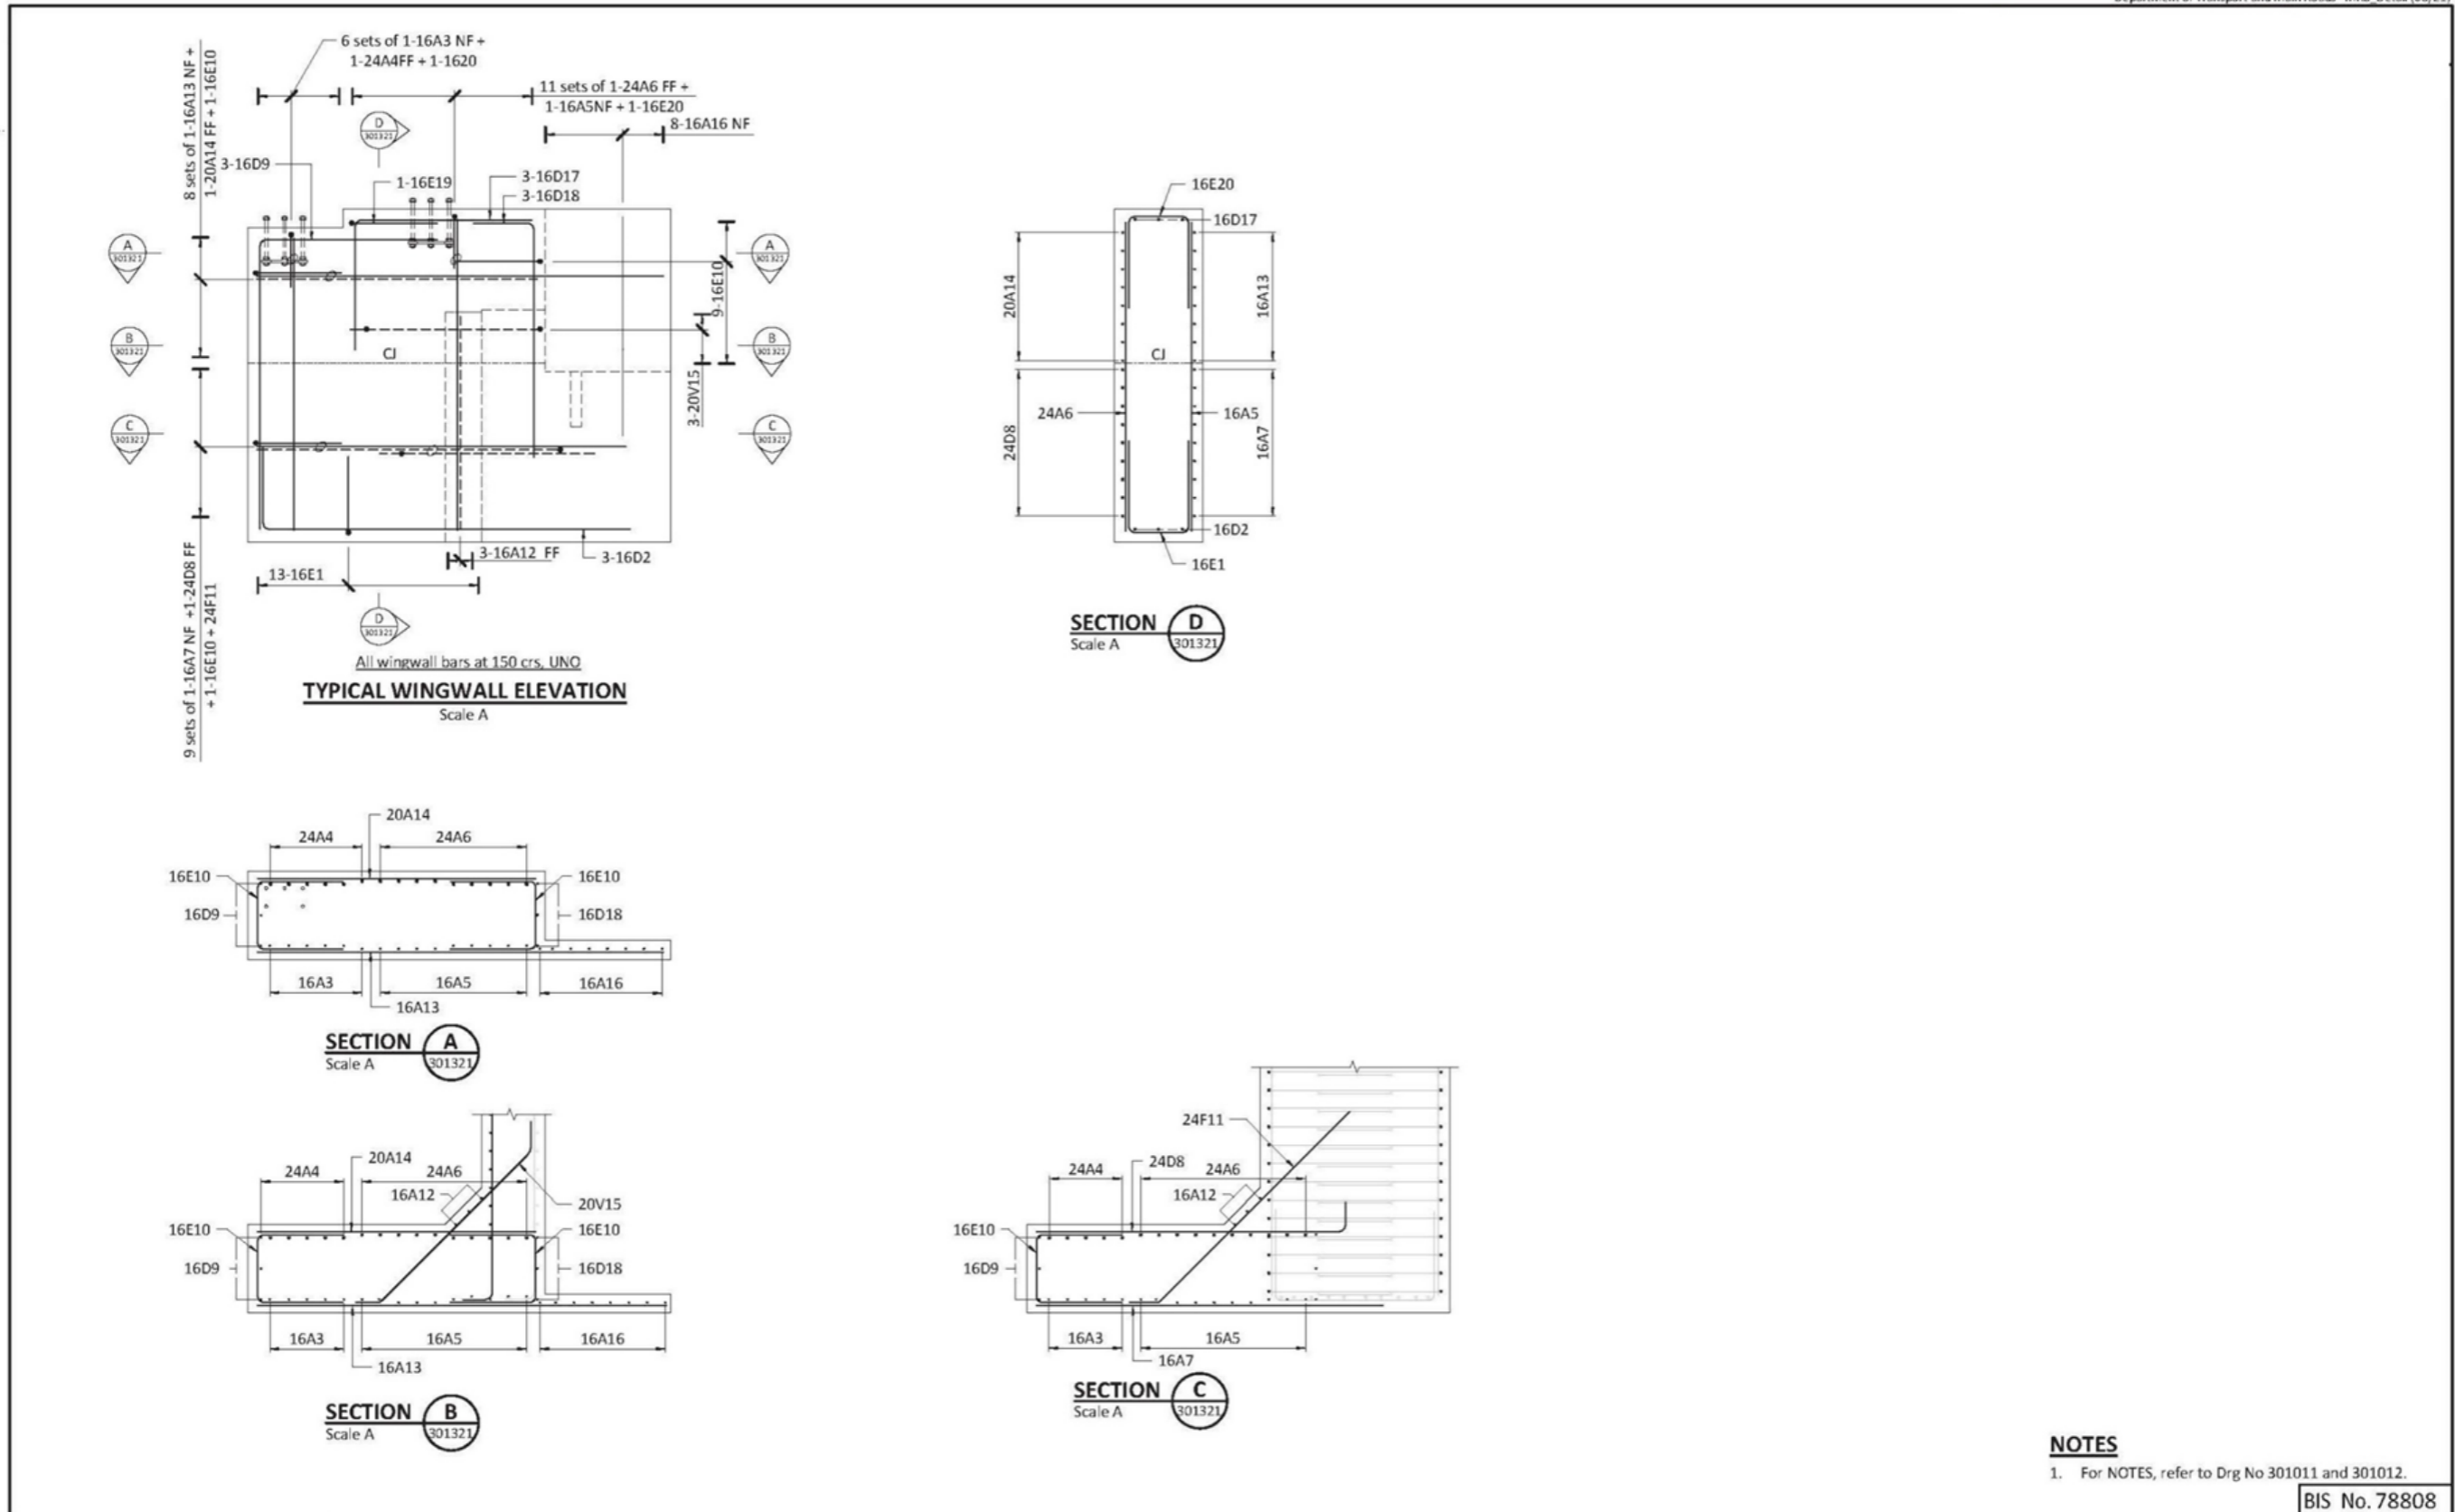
(q) - Example abutment drawings for deck unit square bridge - Sheet 2 - reinforcement details
